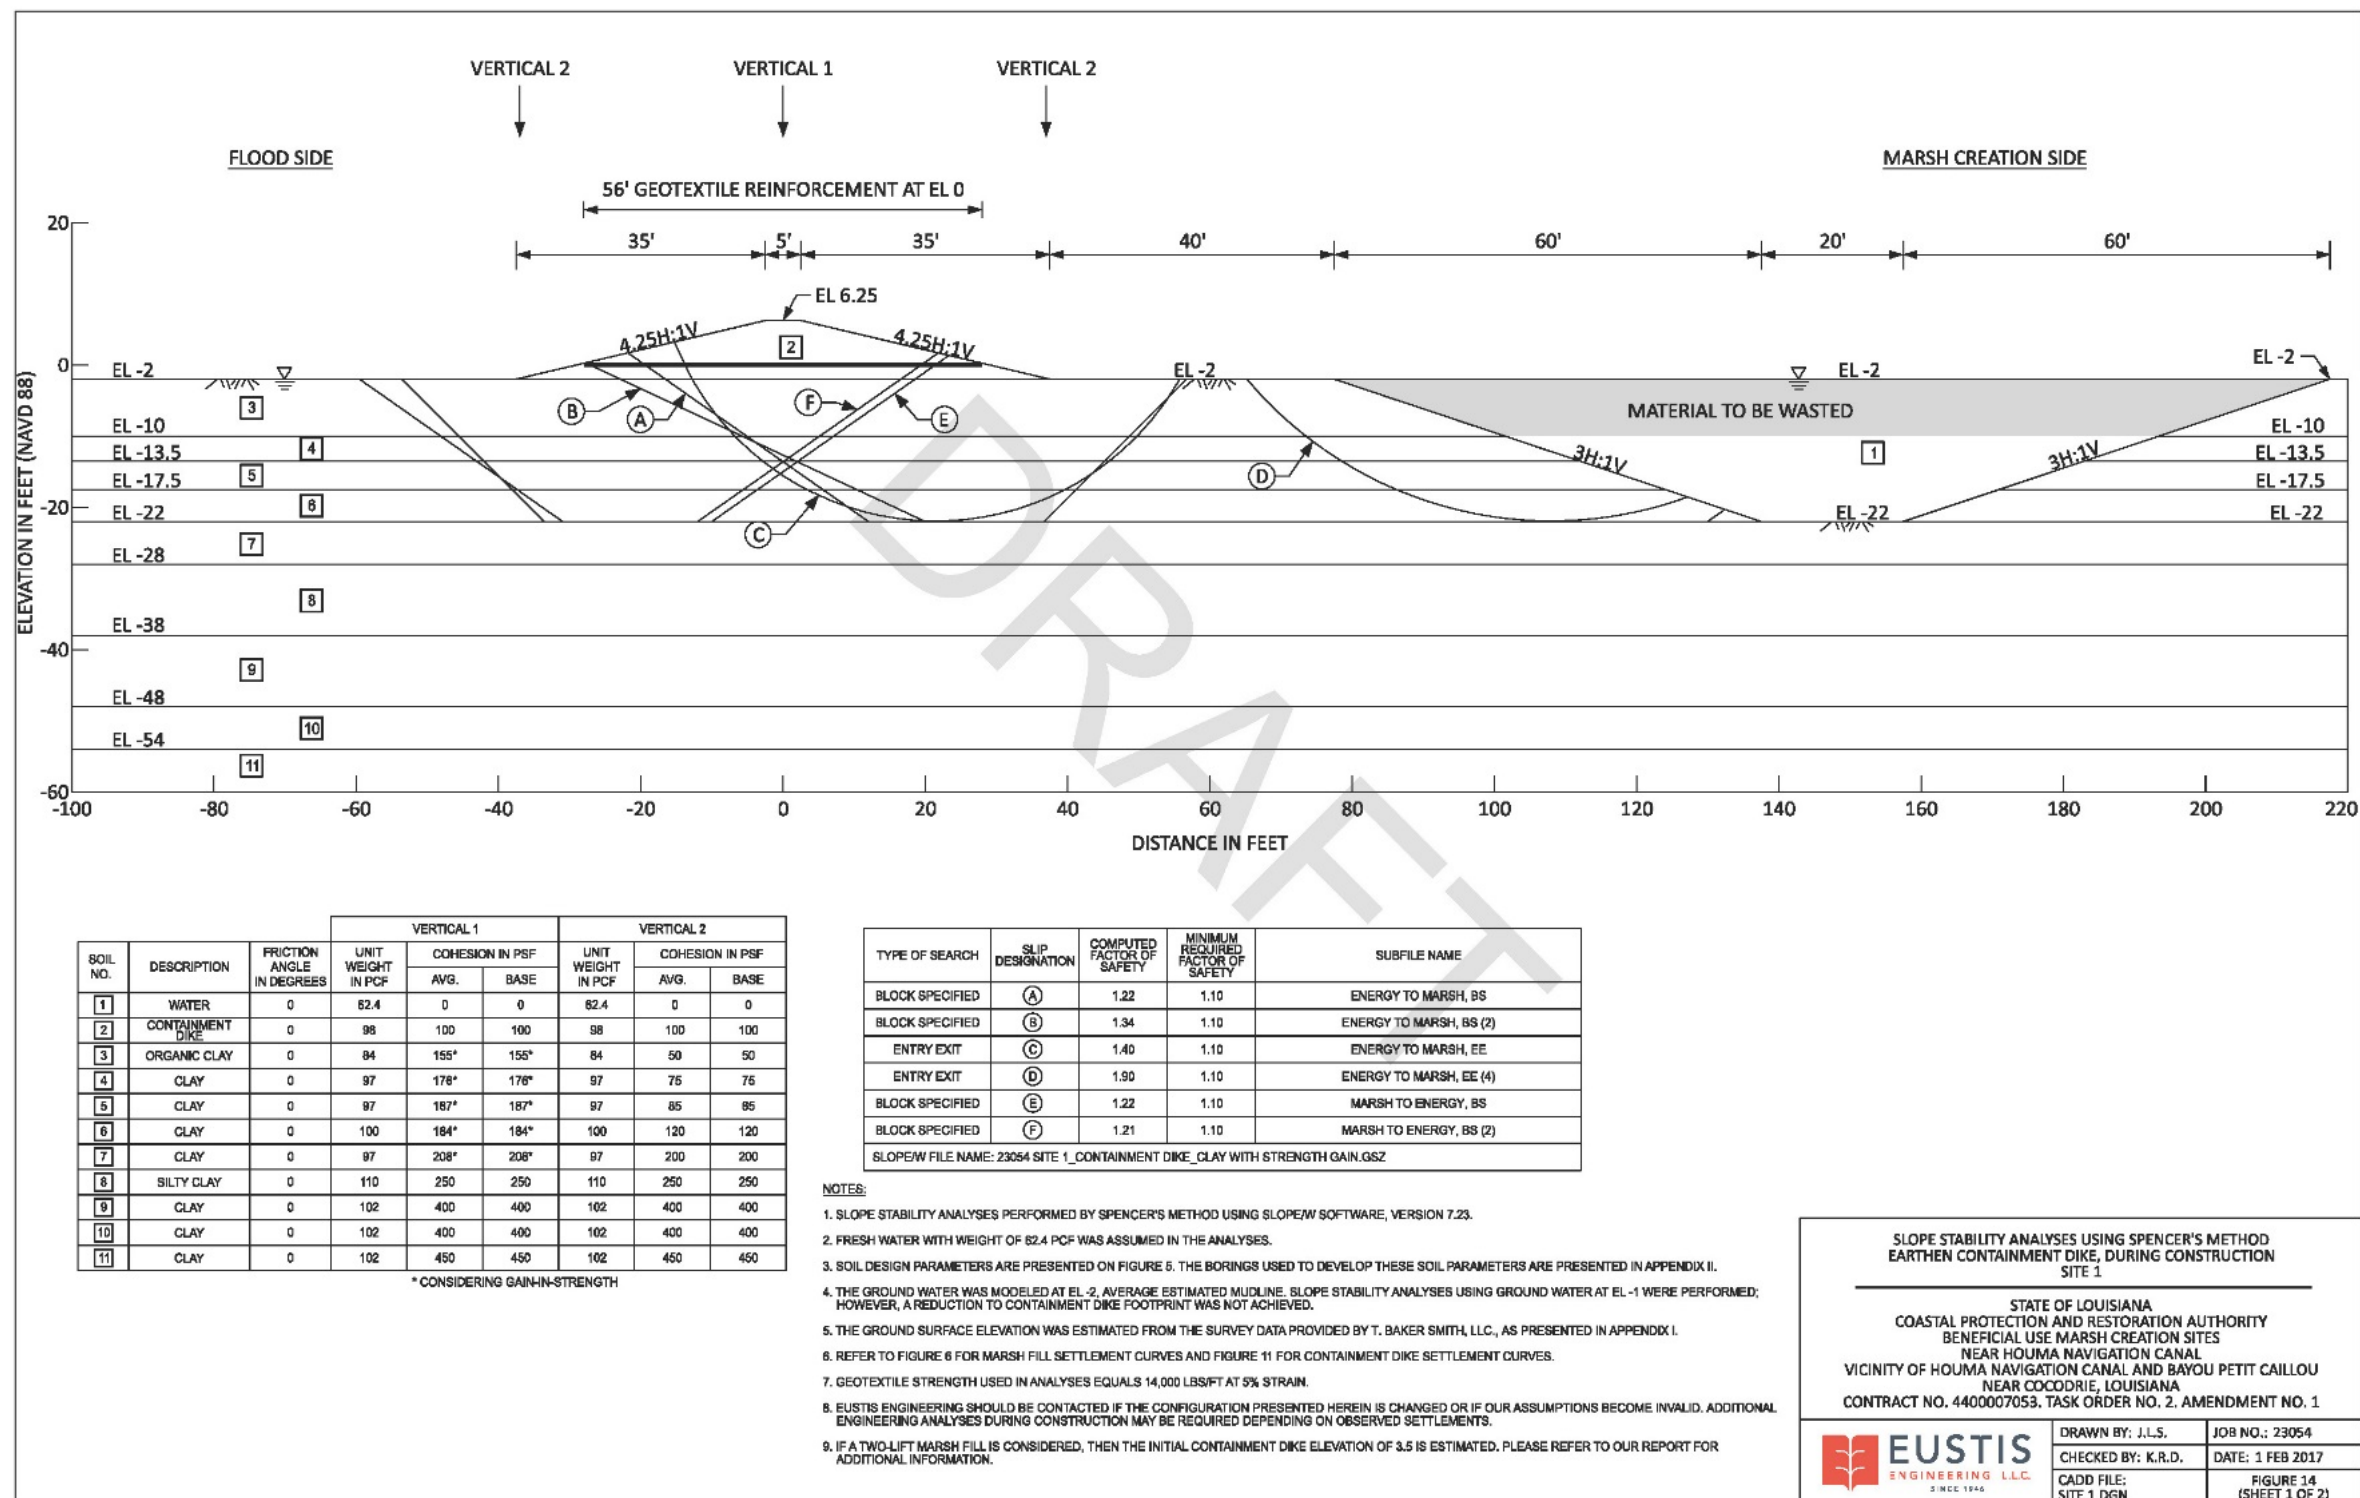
Site 1 Retention Dike and Borrow Design for Dike Construction
